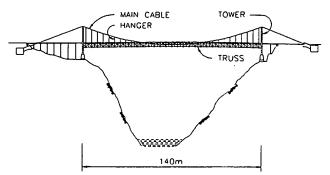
Hagwilget Bridge, general arrangement (107).
